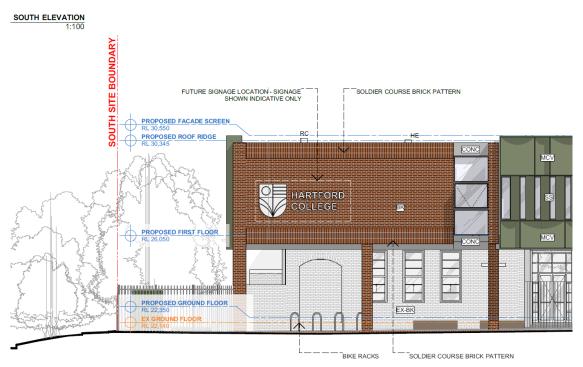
Excerpt from the Southern Elevation Plan indicating area of proposed 'signage zone'
